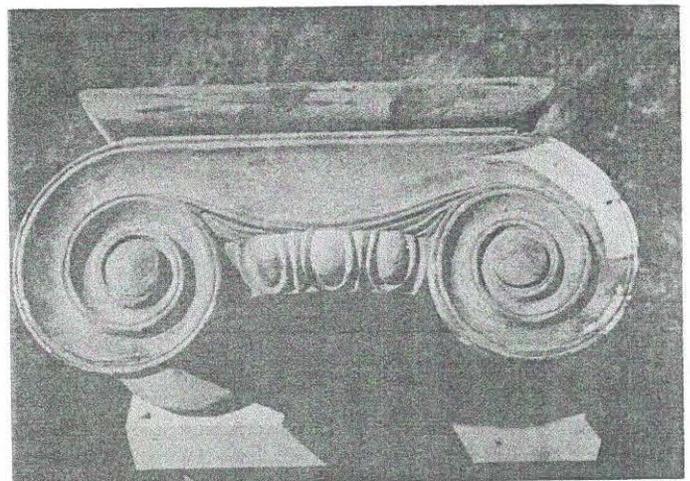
If damage to parts of a wooden element is severe, new sections of wood will need to be pieced-in. When such piecing is required, paint on the adjacent woodwork should be removed so that the old and new woods will make a smooth profile when joined. After repainting, the repair should be virtually impossible to detect. Photo: Morgan W. Phillips.
